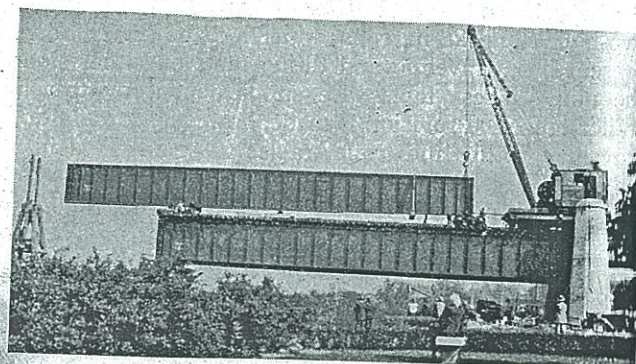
ERECTING A GIRDER, ST. JOSEPH RIVER BRIDGE
